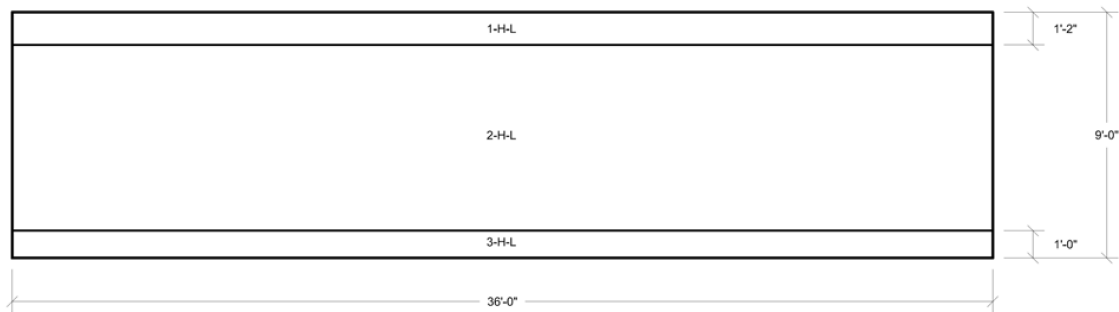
H.7-11 Tunnel Walls Looking From Outside Horizontal Reinforcement Zones Near Side Face
